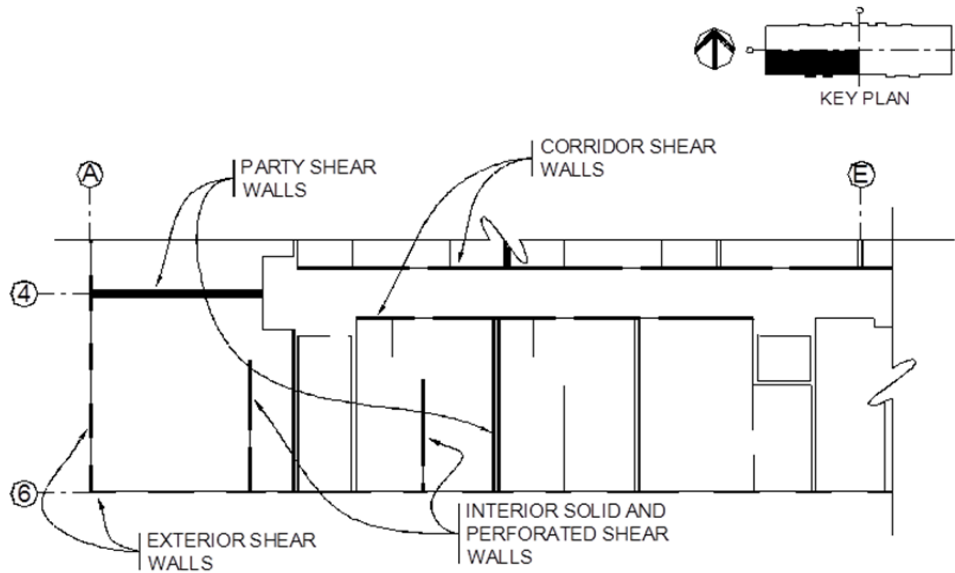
Plan of shear walls (southwest corner) for current national seismic code design.
